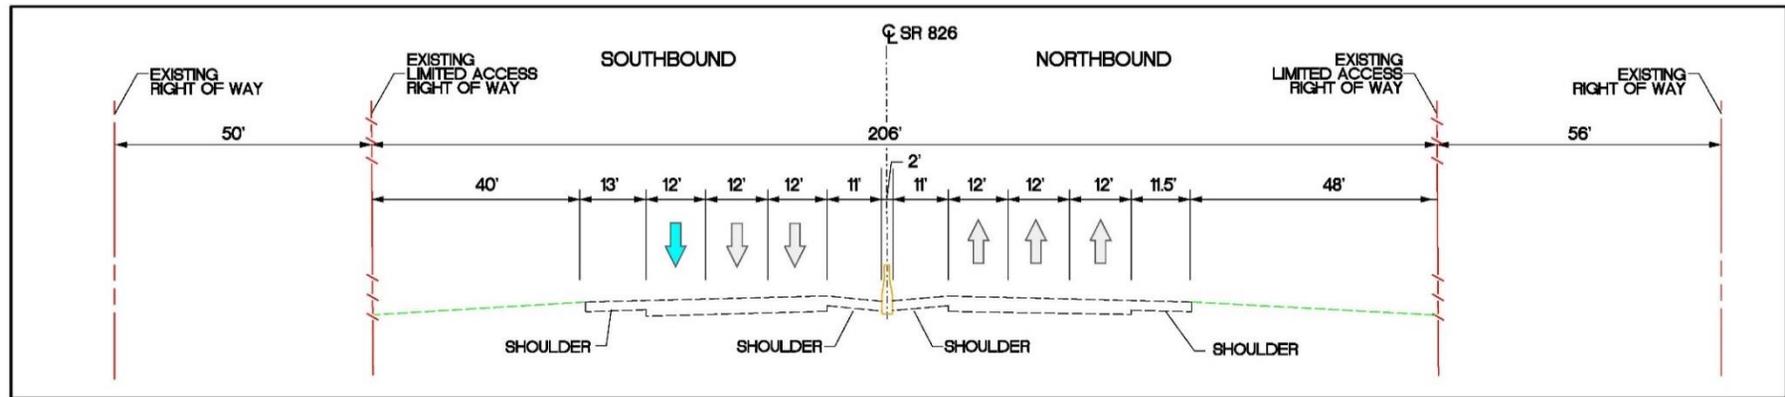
1: Existing Roadway Typical Section between US 1 and SR 874
